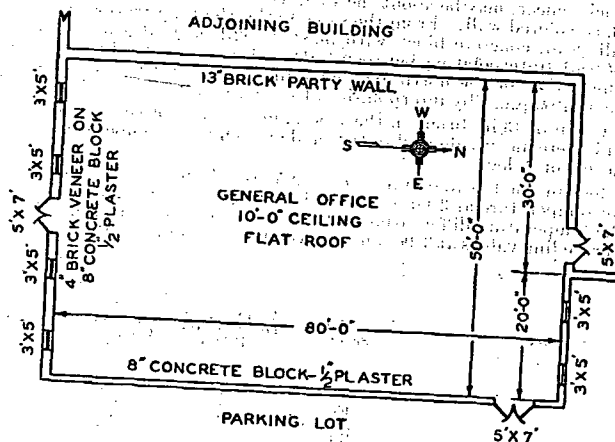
PLAN OF ONE-STORY OFFICE BUILDING
